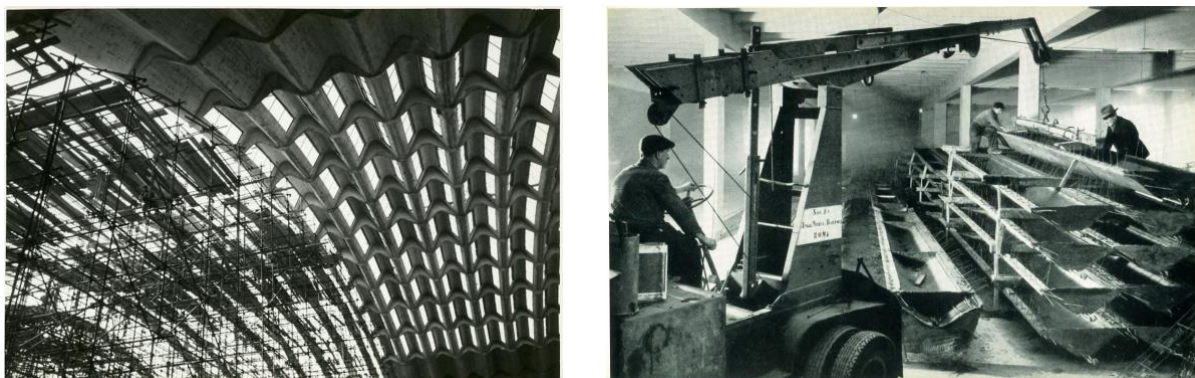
(a) Construction site of Hall B. The construction site's photo shows the mobile scaffolding system used to build the vault (Archivio privato ing. Ravelli). (b) prefabricated undulated beams in ferrocement for Hall C, Nervi [14].
